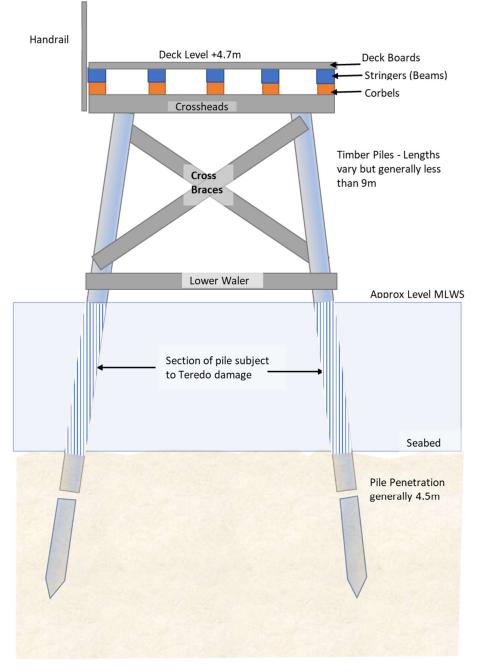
Typical Pier Arrangement - Jetty Approach – prior to silting highlighting areas subject to damage by marine borers
